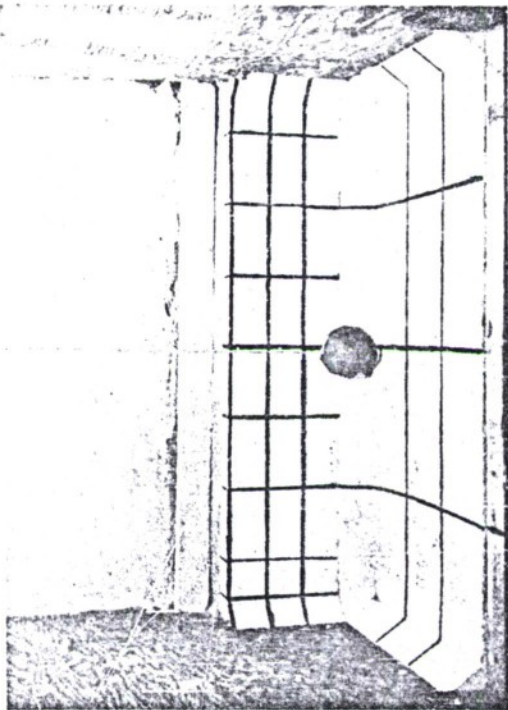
/10 SCALE BAY REINFORCING SHOWING CORNER FILLETS AND STIRRUPS FOR FULL DEVELOPMENT OF TENSION REINFORCEMENT
